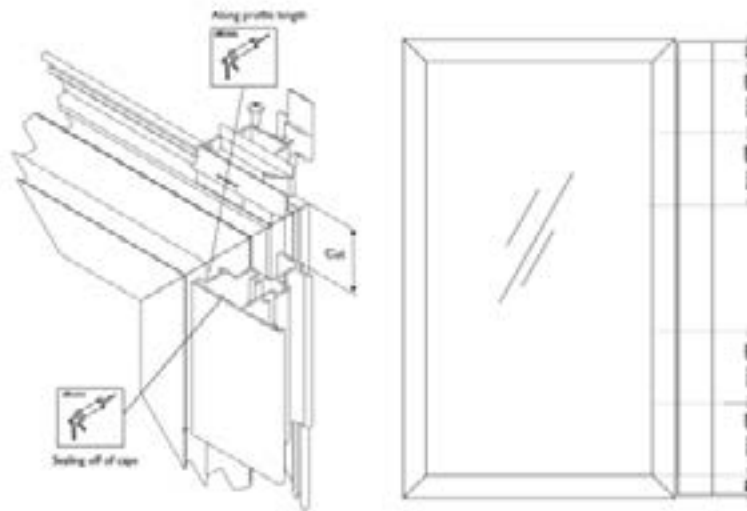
Installation of meeting style onto the sash – Fixing dimensions
